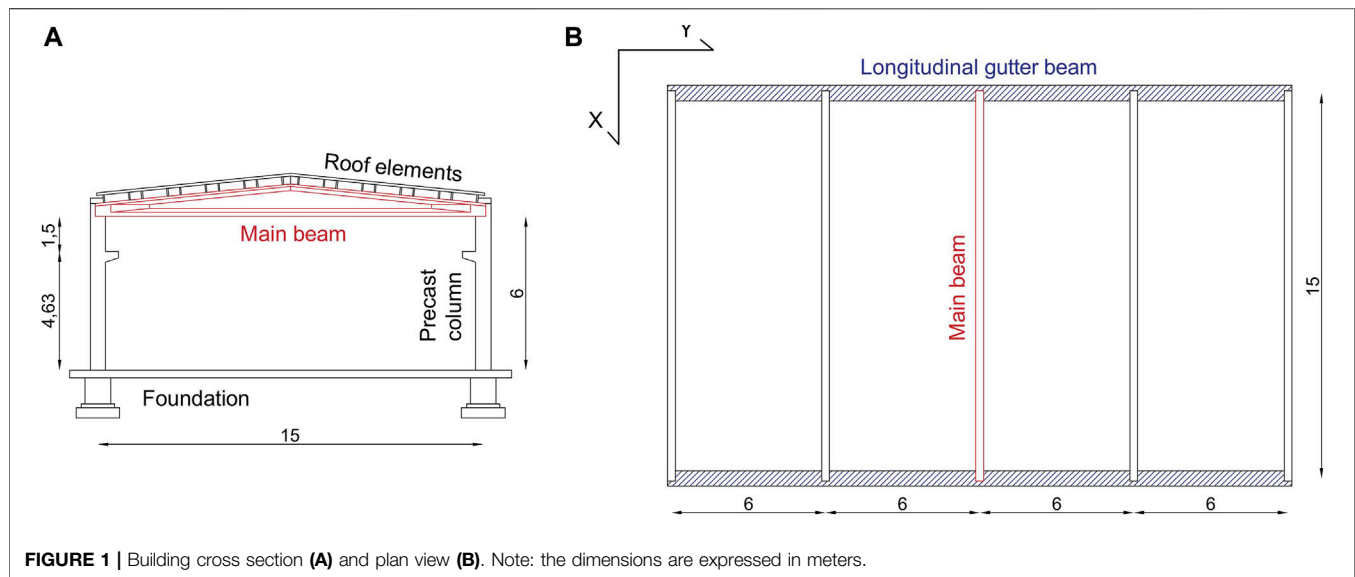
| Building cross section (A) and plan view (B). Note: the dimensions are expressed in meters.
